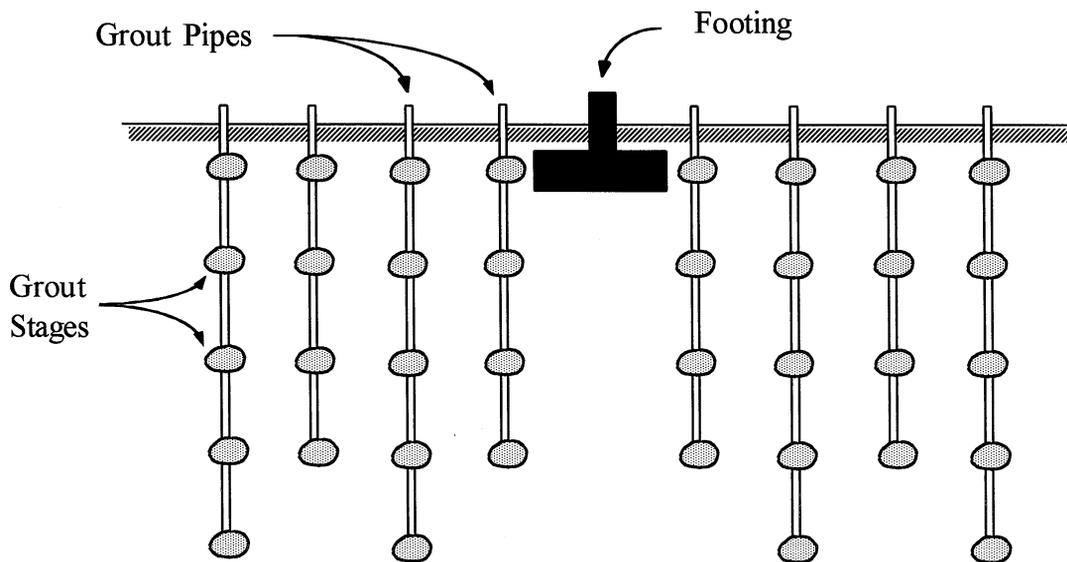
Section Showing Compaction Grouting Around Footing (after Graf, 1992)
